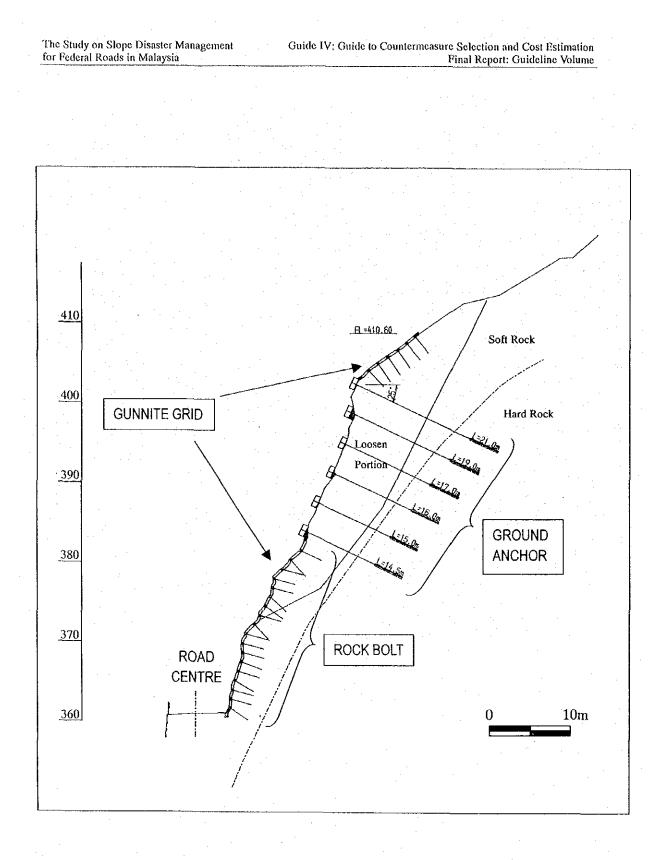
Section of Countermeasure Design against Rock Mass Failure (RM)
